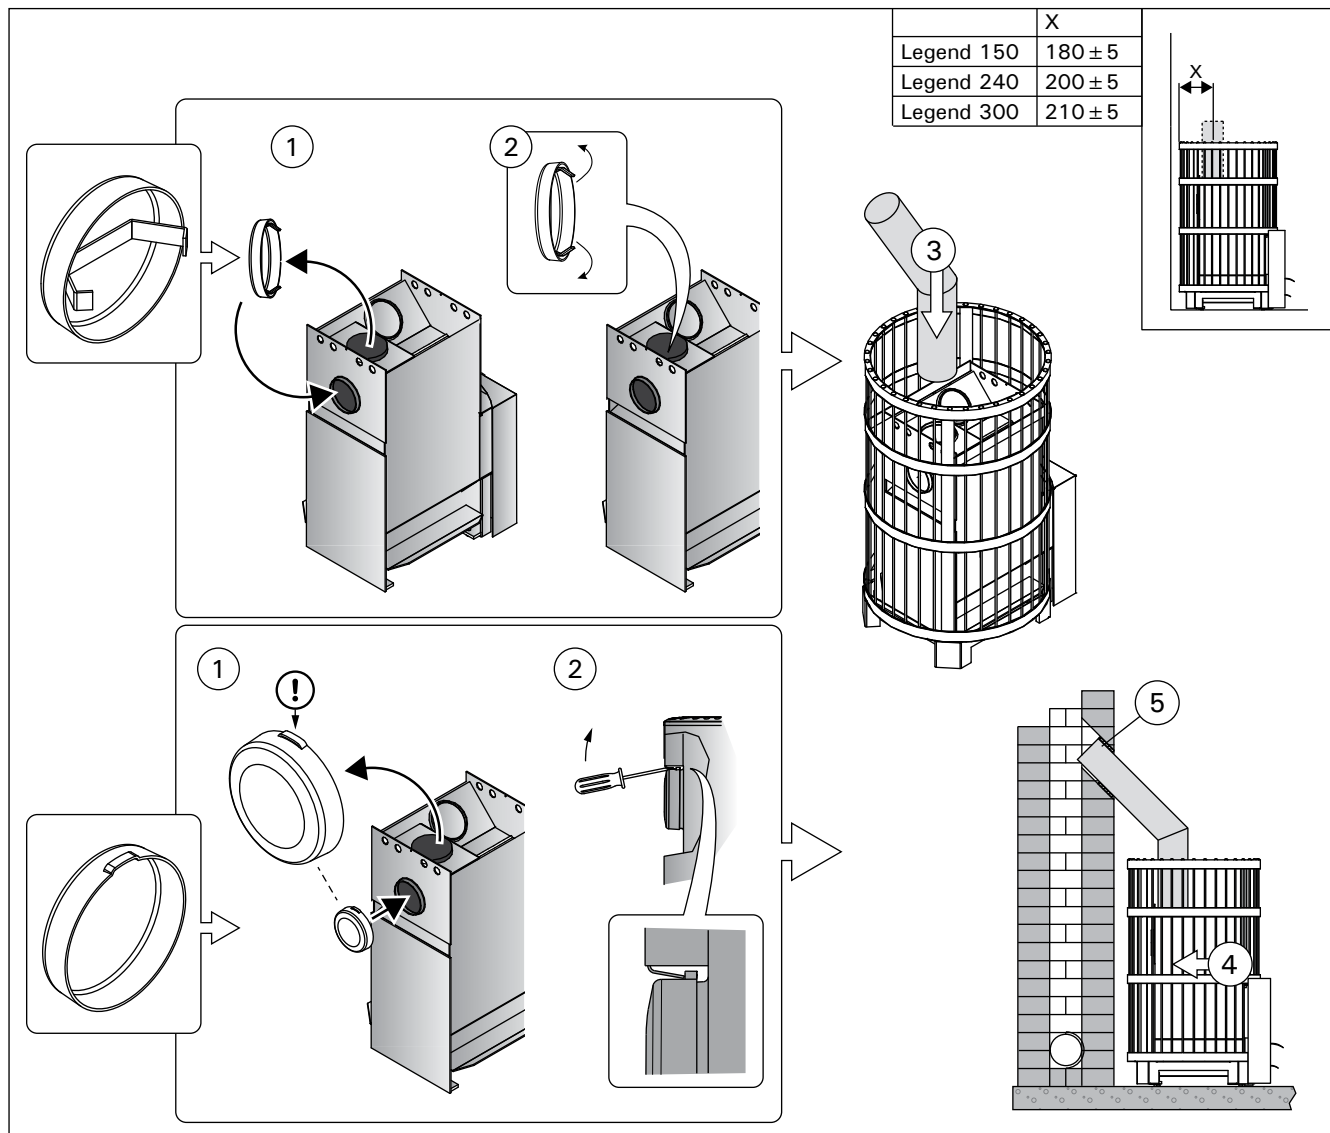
Connecting the stove to a masonry flue via the upper connection opening (all dimensions in millimeters)
